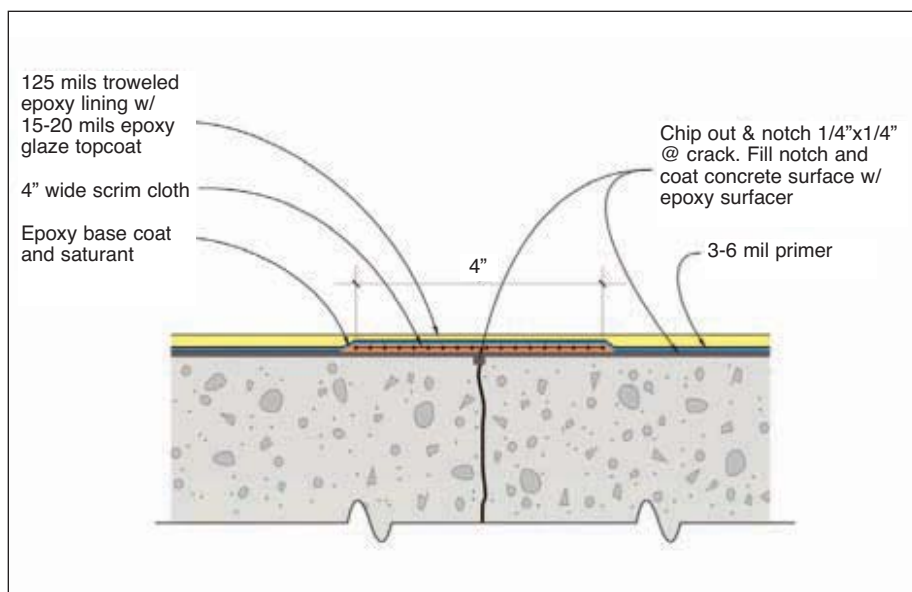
Typical lining detail at concrete cracks (N.T.S.).
